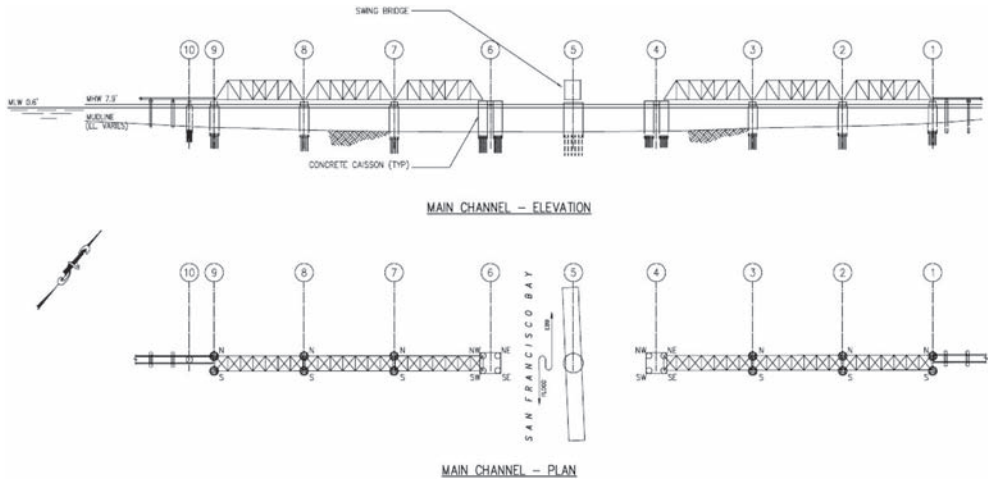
Dumbarton main span—swing span and steel trusses (Section 4 to 9).
